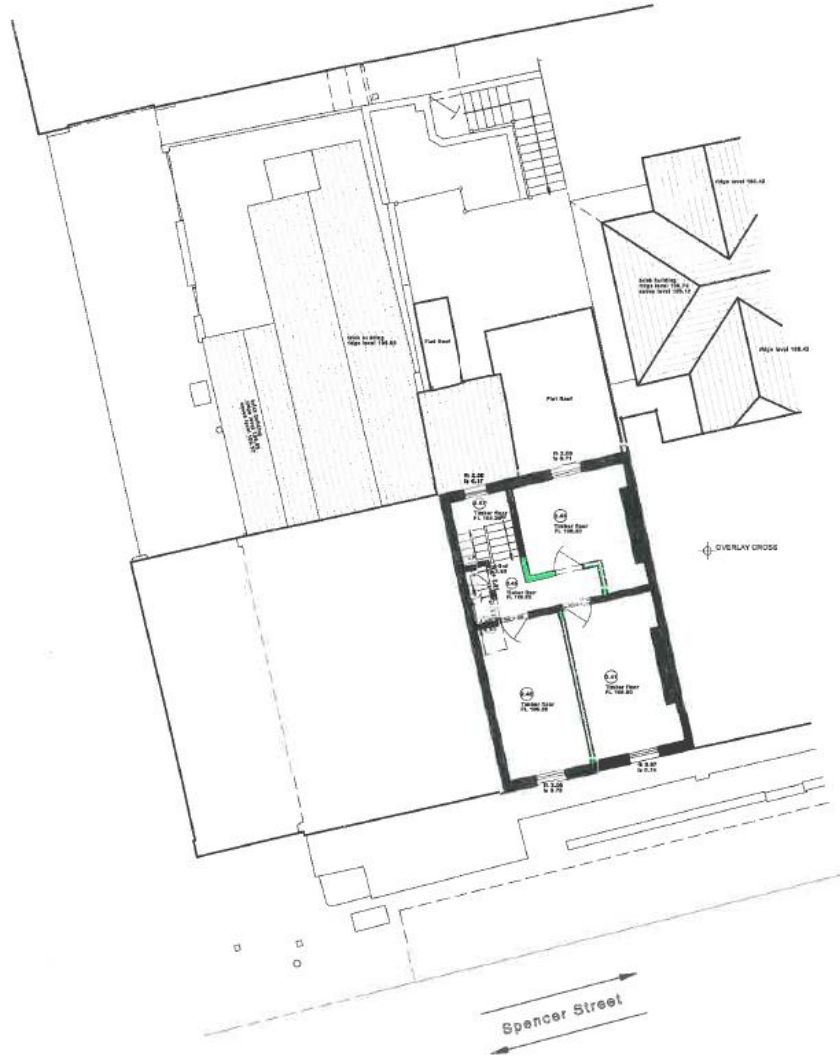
Second Floor Plan, with original building in black, and 1980's additions in green.
